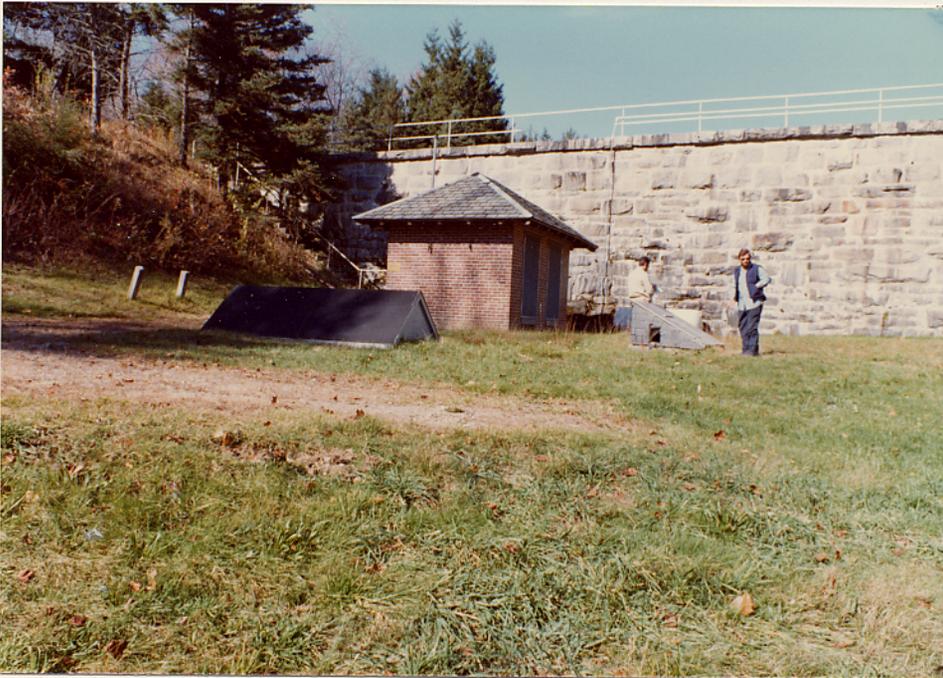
Brick Chlorine house, valve chamber for 20 inch
